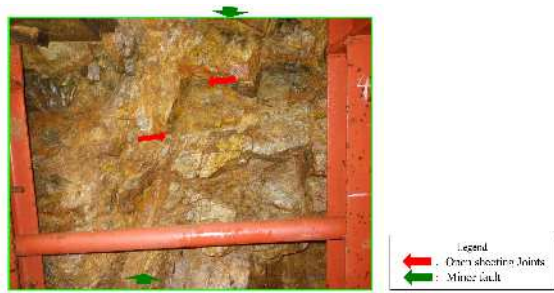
Sheeting joints on the downstream wall of Adit 7-R
